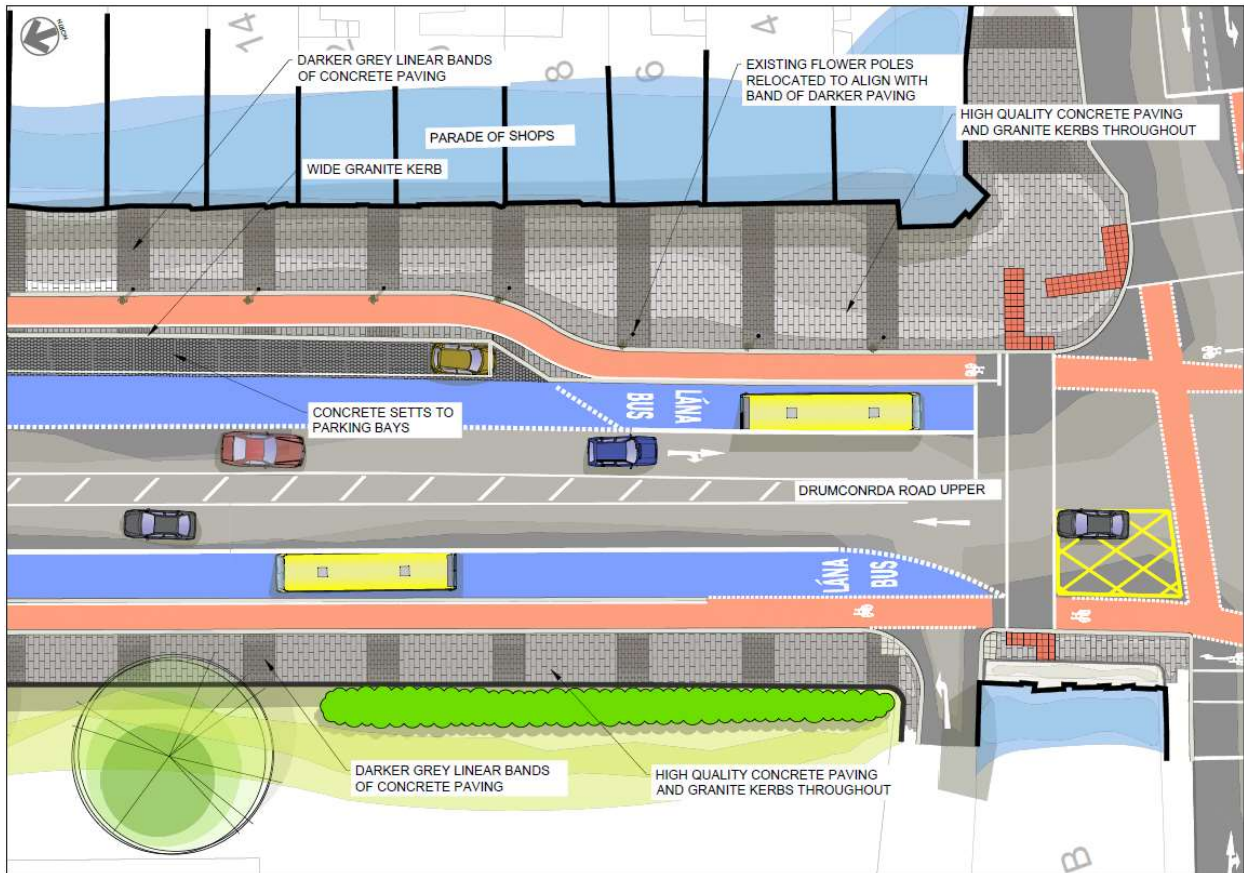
Drumcondra Road Upper Shopping Parade Design
